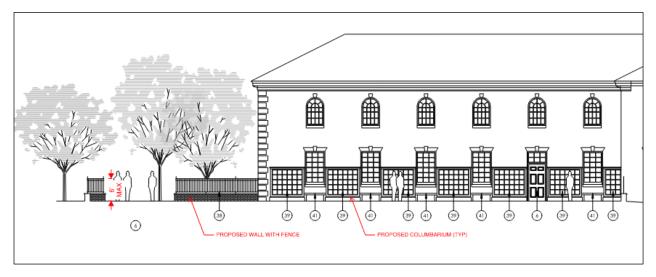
Rendering of south elevation showing proposed columbarium and fence locations
